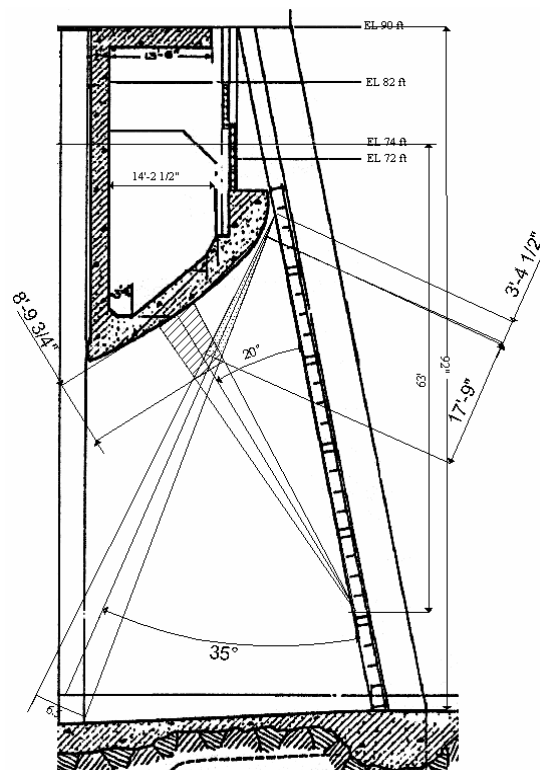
Cross-Sectional View through a B1 Turbine Intake Showing Near-Ceiling Volumes of a Single Down-Looking Transducer Beam Compared with that of an Up-Looking Transducer. Flow into the intake is from right to left.
